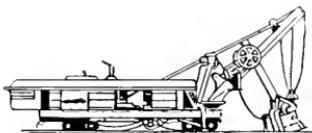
A Power-operated Shovel carried on standard-gauge railway tracks, is suitable for excavating earth in foundation work, railway construction, and for open pit mining in stone quarries, coal mines, and iron mines. The size of the dipper varies from 5 to 15 tons and the radius of the boom from 20 to 150 ft. This latter requires especially wide-gauge track.
